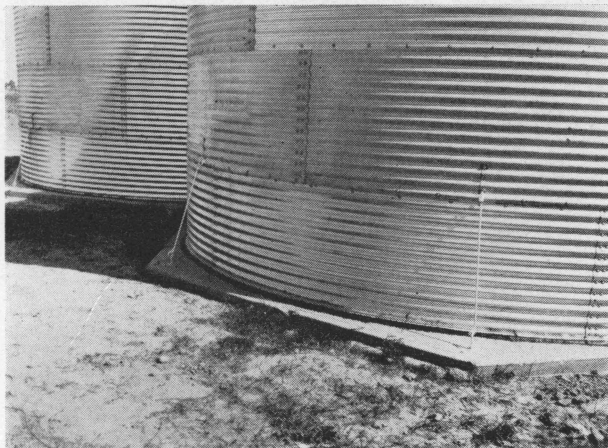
A concrete foundation showing a good method of anchoring the bins. Note the caulking required to prevent entry of water. Be sure adequate drainage is provided and slab is sloped so water drains properly.
